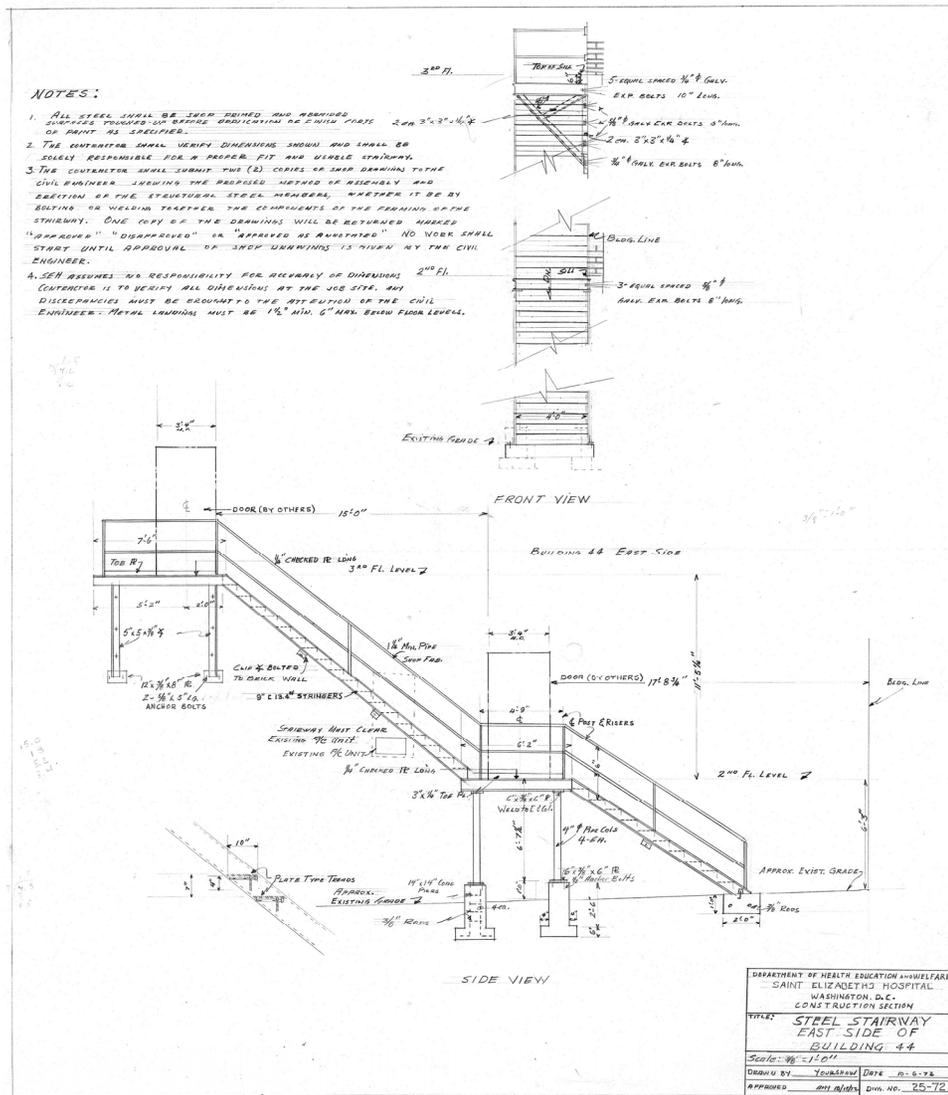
Construction drawings for the addition of the south facade exterior stairway, 1972. Source: GSA archives, image DC1458SE0102.
